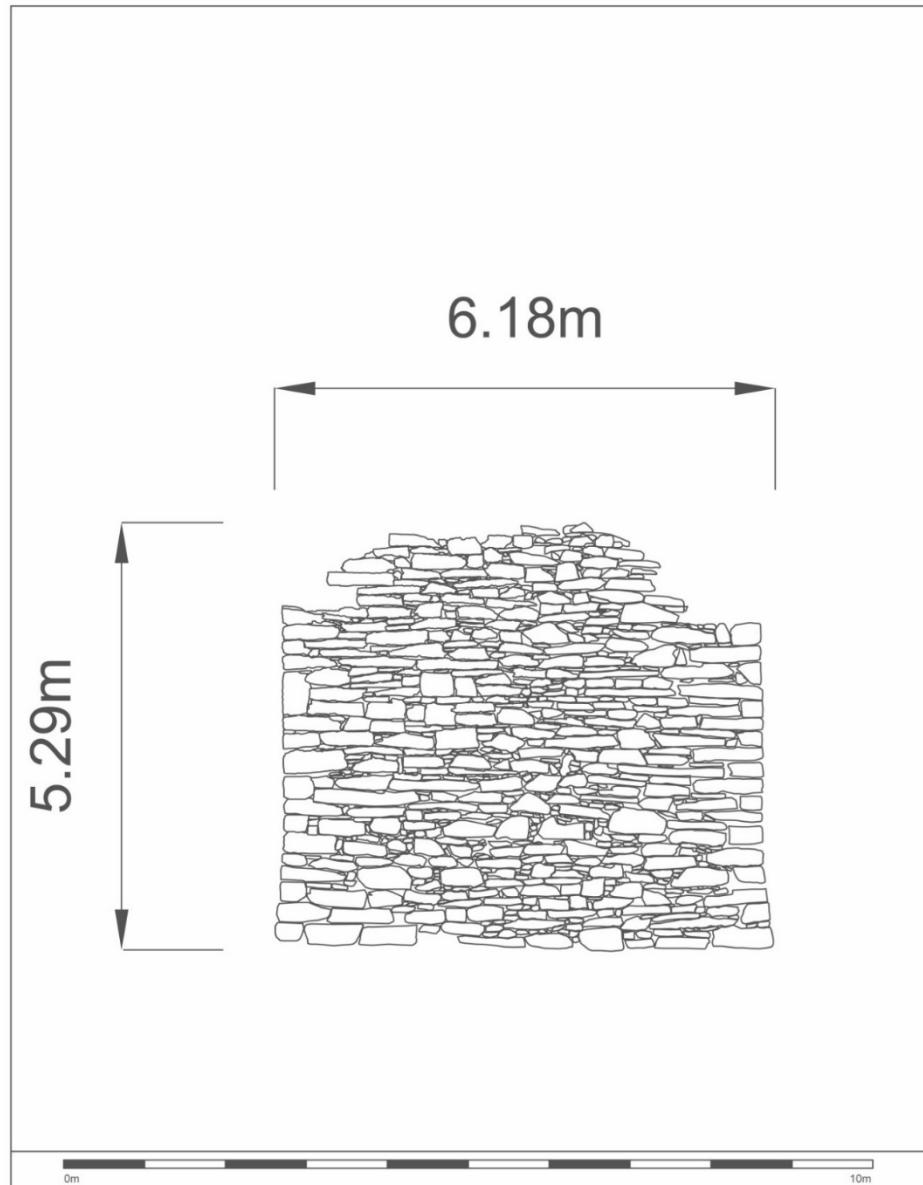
External elevation of the west wall of Saddle Hill Signal Tower.
